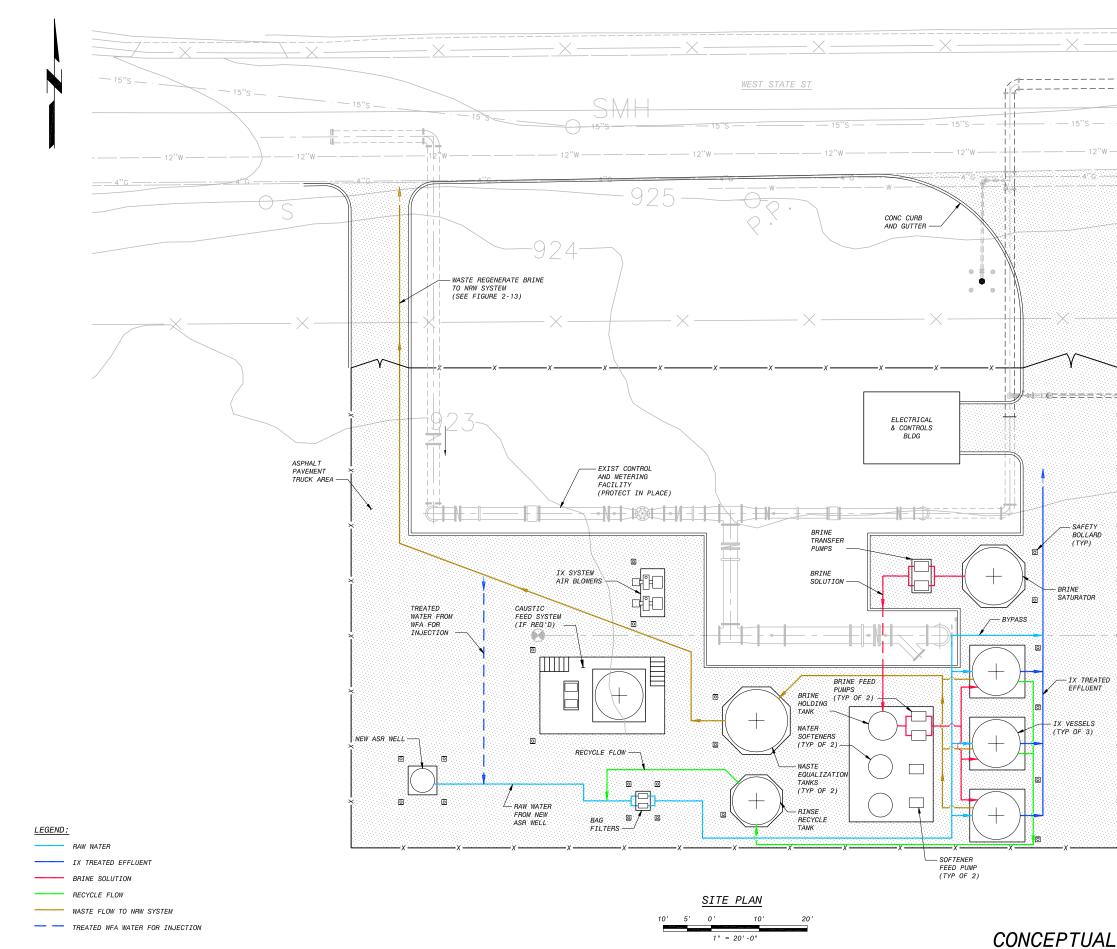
, 2-8, and 2-9 present conceptual site layouts for the new IX facilities. Raw water from the new wells would be conveyed to the IX vessels, where a portion of the flow would be diverted as a bypass stream. Treated water from the IX vessels would be blended with the bypass stream, sent to disinfection, and delivered to a treated water storage tank and/or the distribution system.
